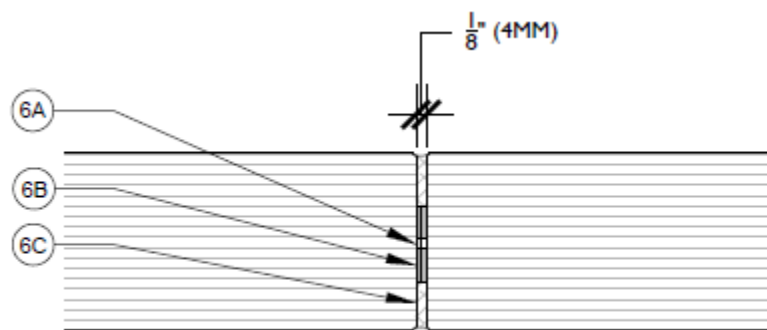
Pyrobel 60-25 Butt Glaze Details
